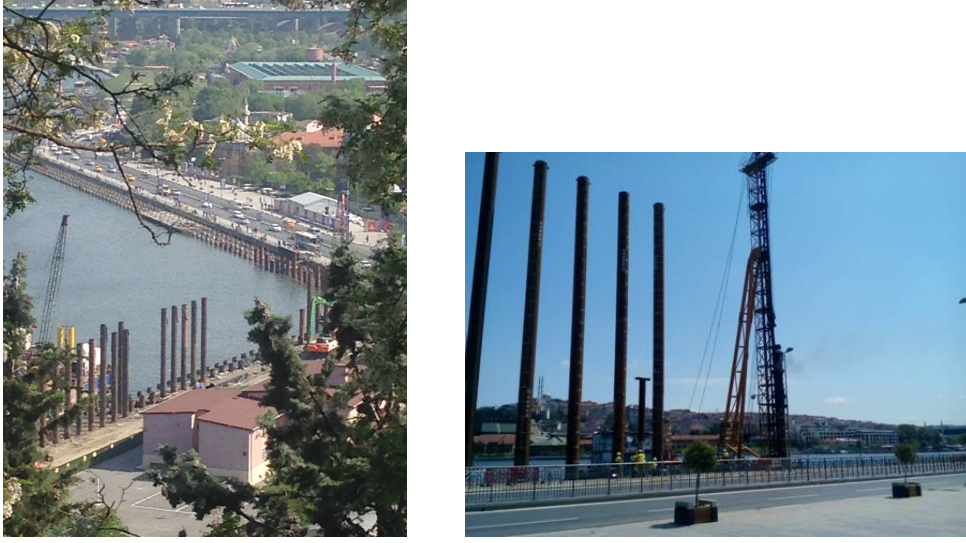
View of the pile driving site in Eyüp-İstanbul a) Layout view from Pierre Loti hill b) Piles being driven by hammer
